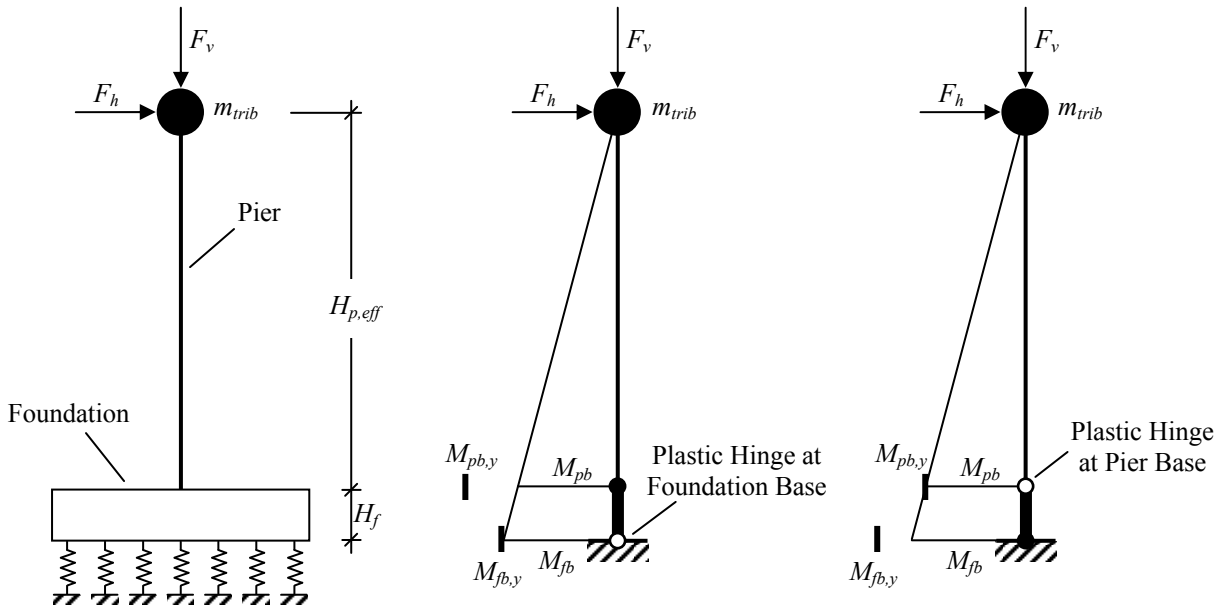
SDOF cantilever pier model with two potential plastic hinge positions
